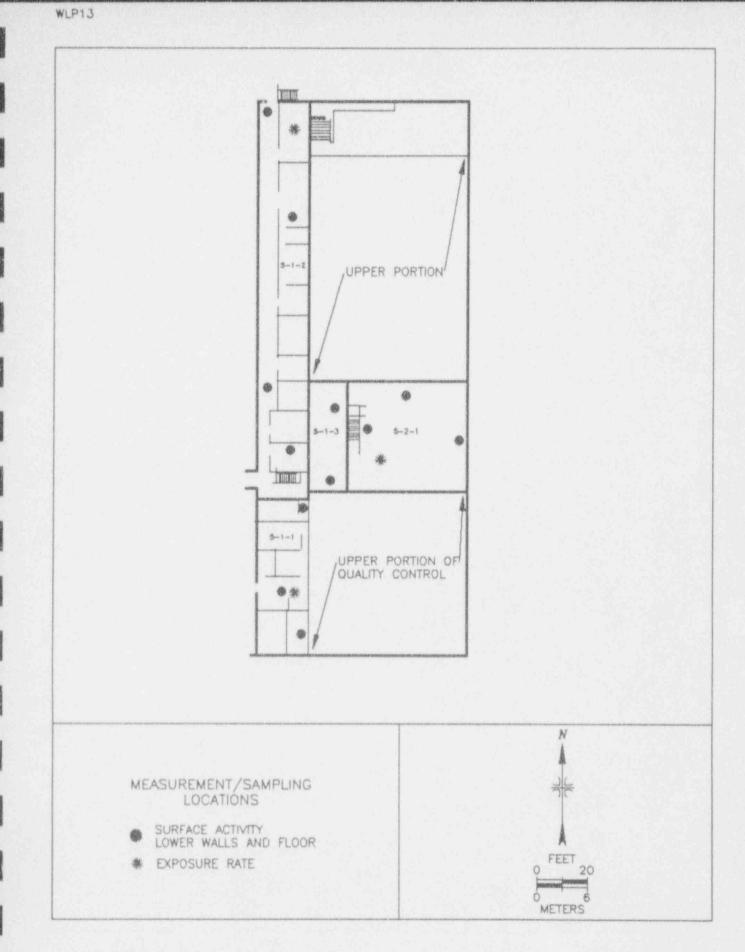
Building 6, Second Floor - Measurement and Sampling Locations
